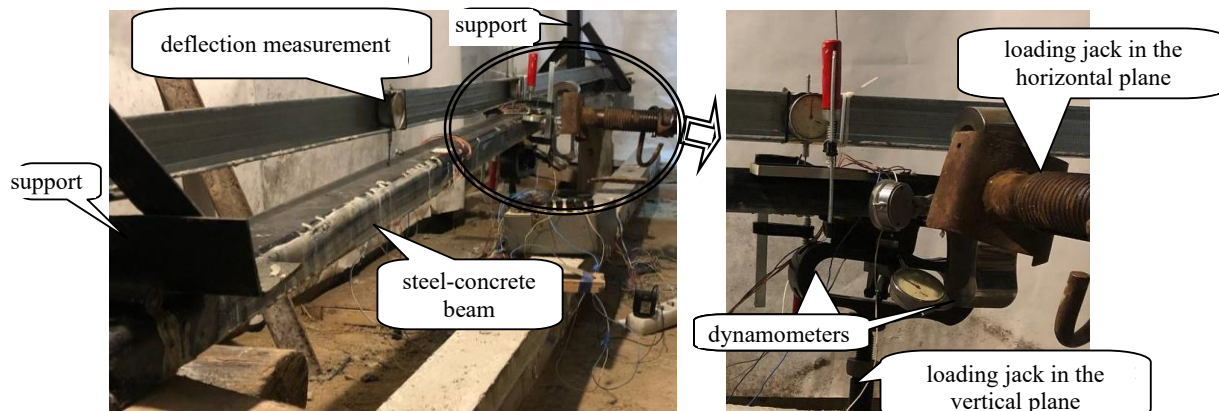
General view of the steel-reinforced concrete rete beams during testing
